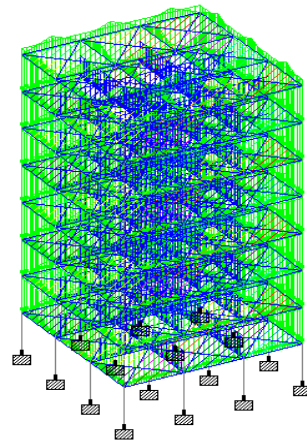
Assigning of Interior Wall Load (12.04KN/m)
